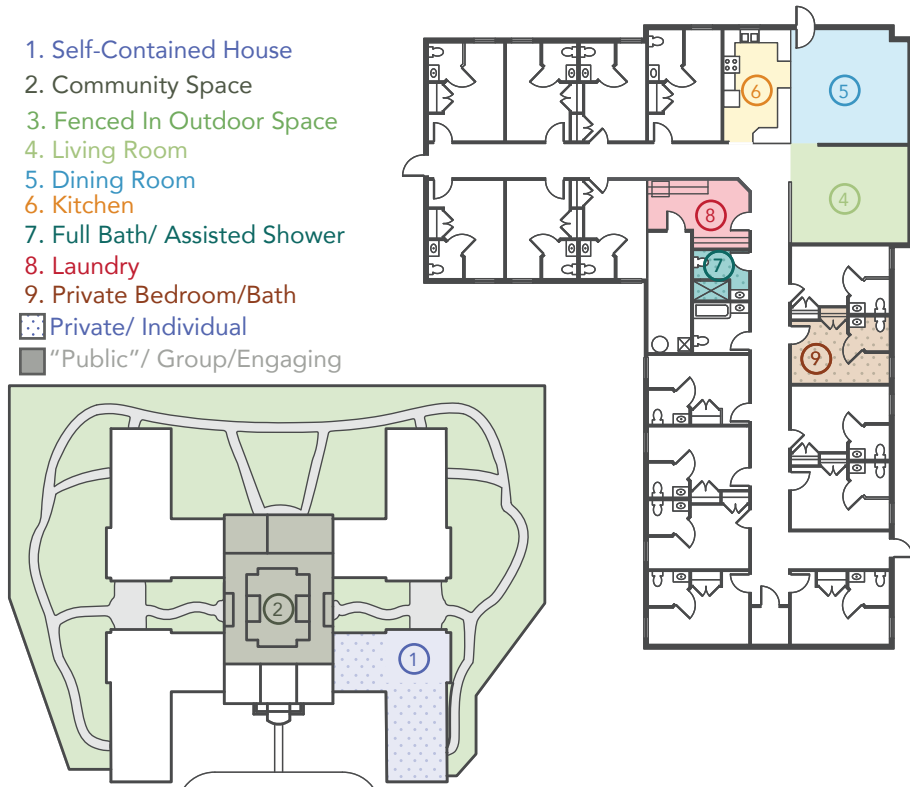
Arden Courts Site & Floor Plan, created by author.
